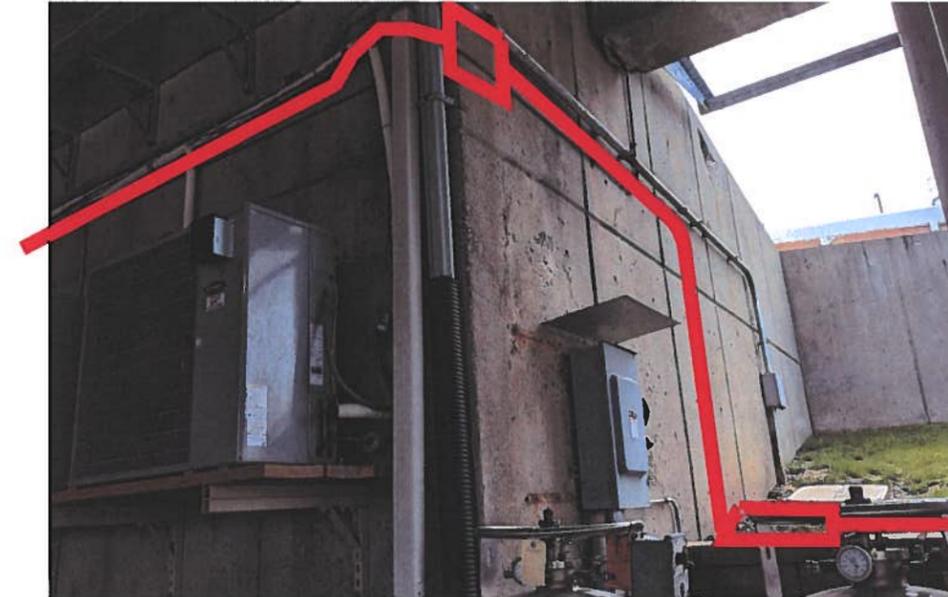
PROPOSED PATH FOR 2" EMT CONDUIT THROUGH PROPOSED SMALL PULLBOX FOR 90° BEND. (FACING EAST) - SECTION A-A AND SECTION B-B
